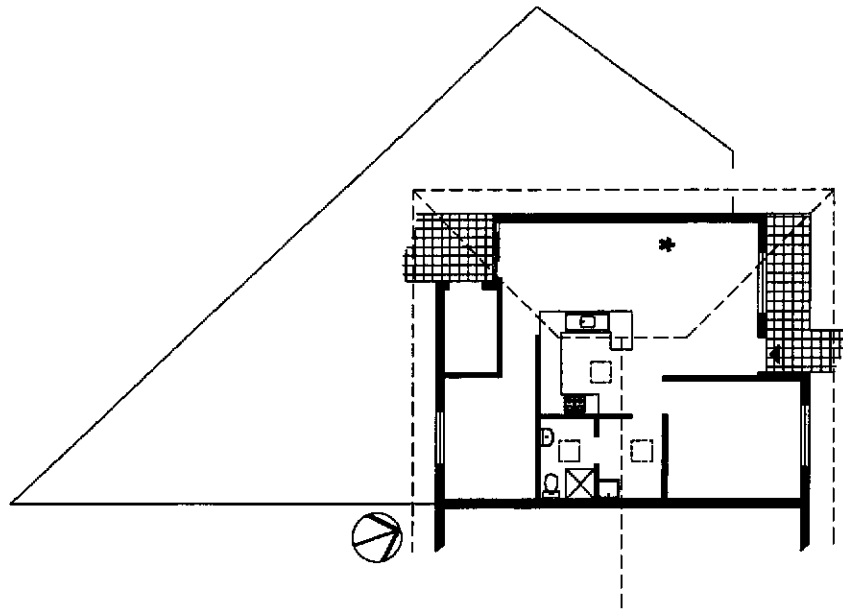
Floor Plan Dwelling 3D - Monitored in summer and winter
